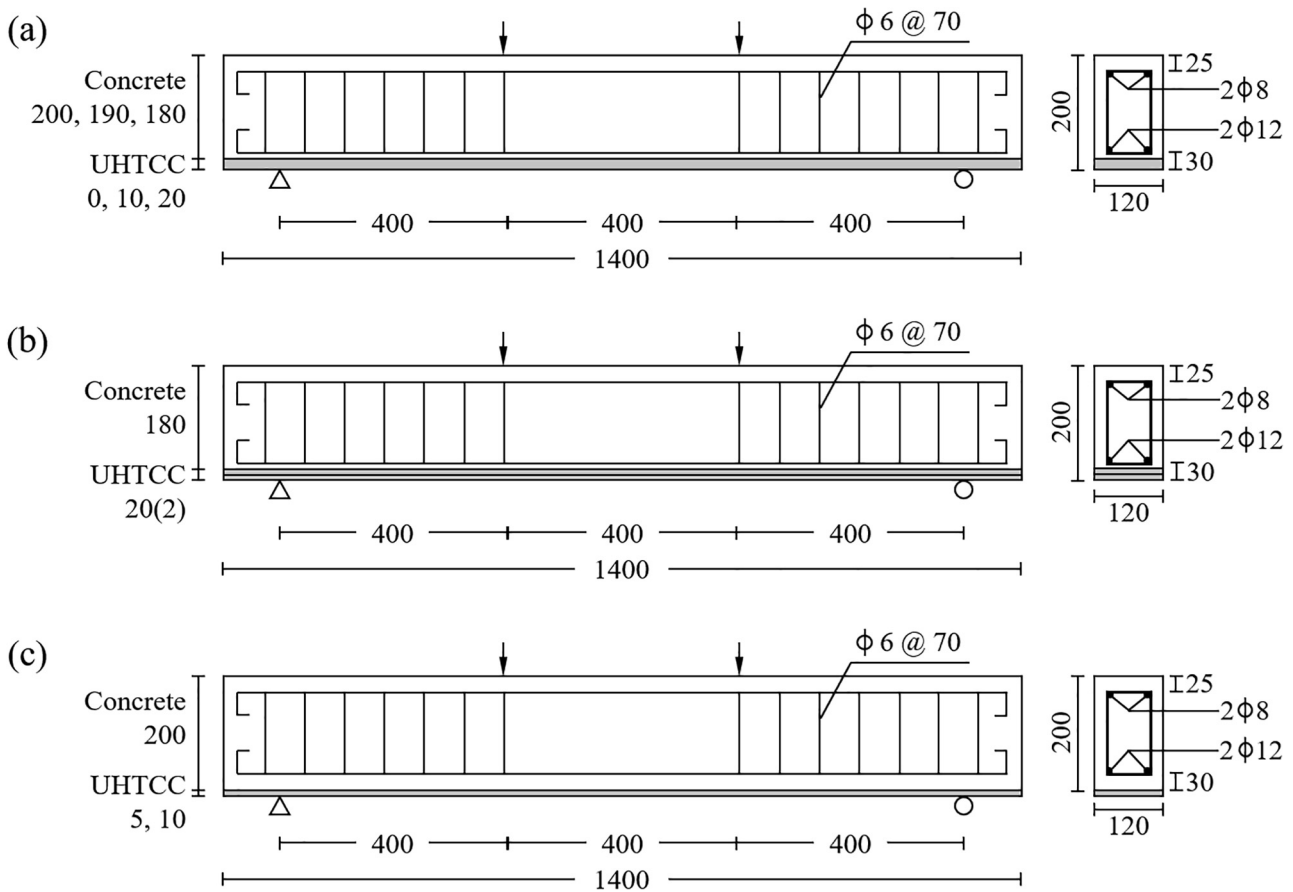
Specimen details and test set-up of the four-point bending test: (a) sprayable-UHTCC-strengthened RC beams; (c) sprayable-UHTCC-strengthened pre-loaded RC beams.
